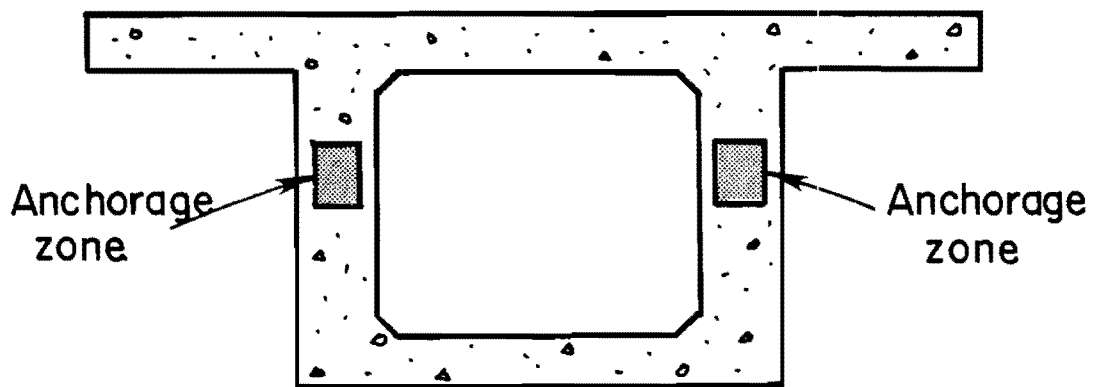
Anchorage zones in a thin-webbed box-girder section
